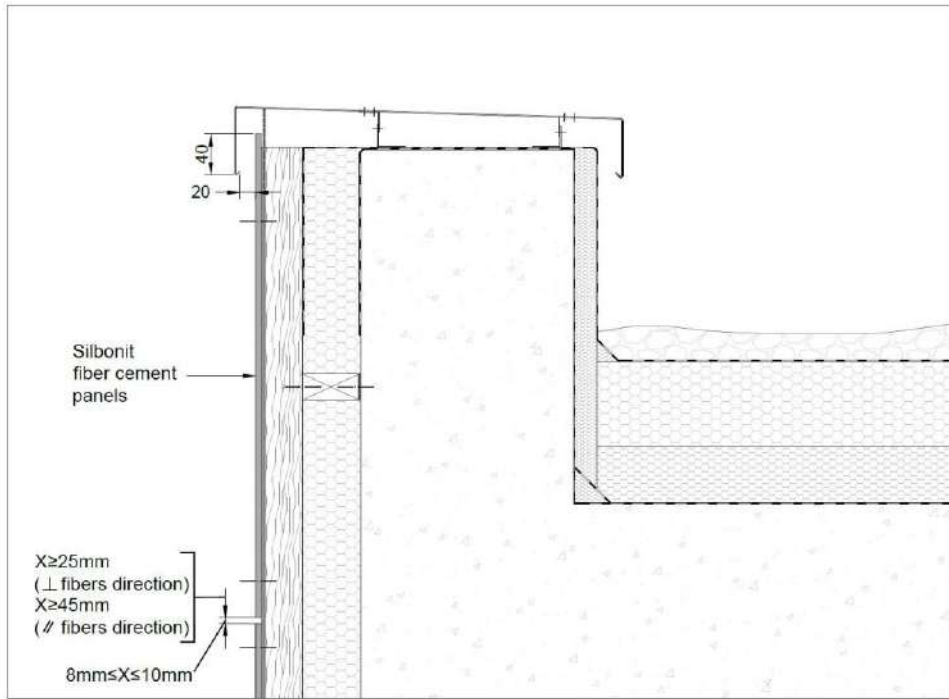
Example of vertical sections of the coping of the ventilated facade cladding. Wooden subframe.
